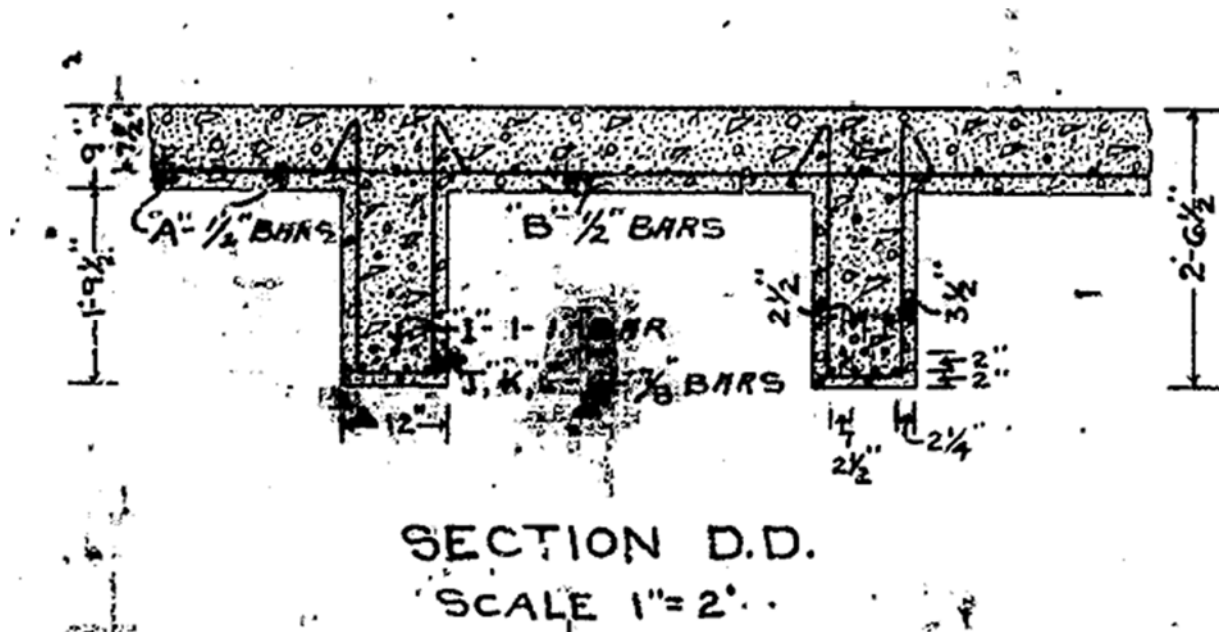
Structure 1703152 – Beam and Deck Dimensions
